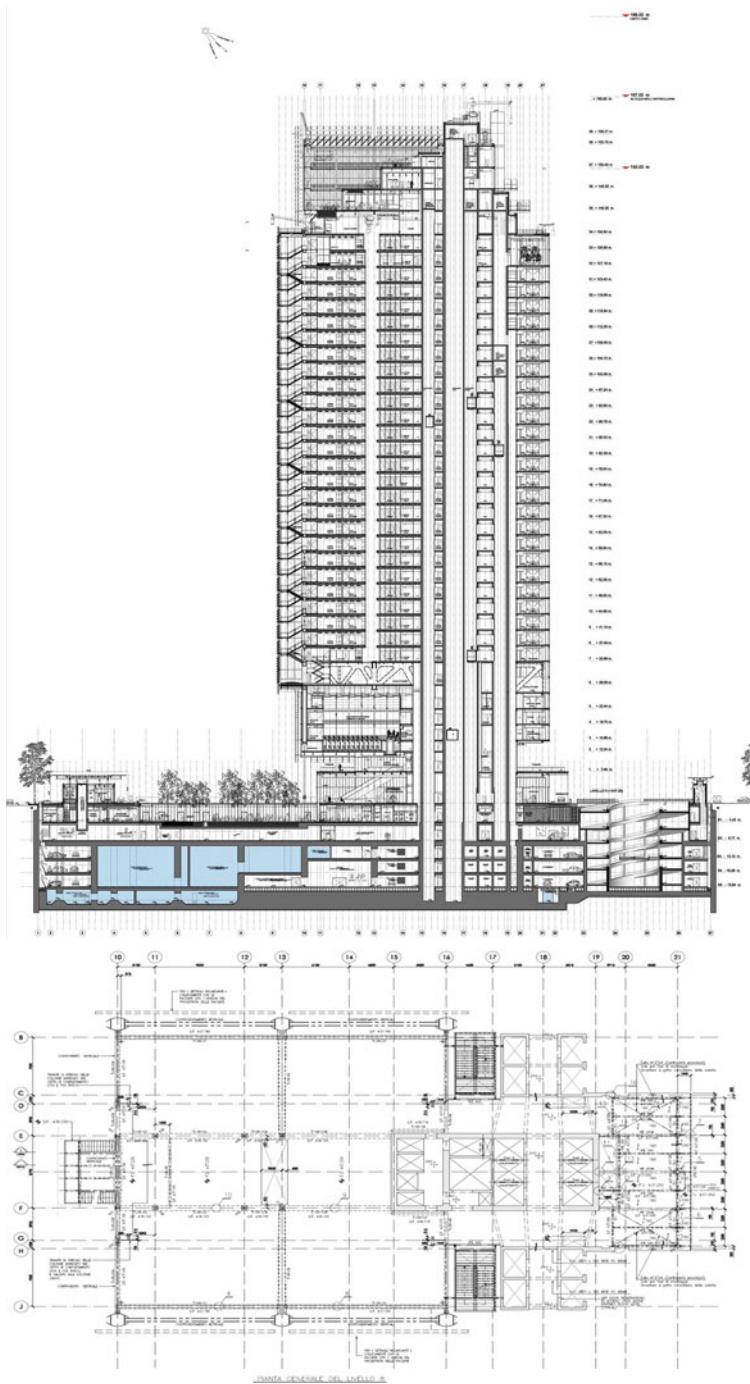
Longitudinal south-north section and plan view of the Intesa-San Paolo Tower in Torino
